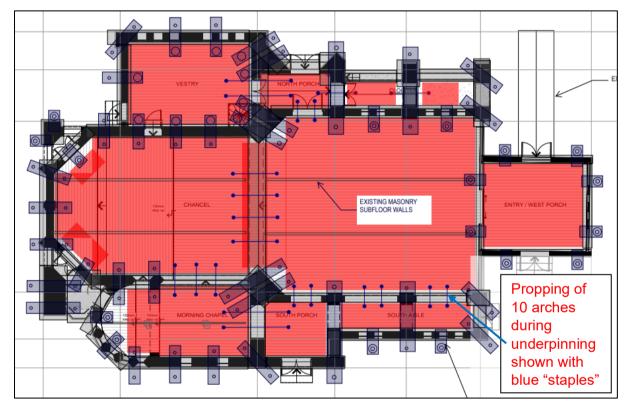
Early works plan - Existing floors to be removed to allow drilling of piers to interior of church. Note: North is to the right of this image. (Source: BT)
